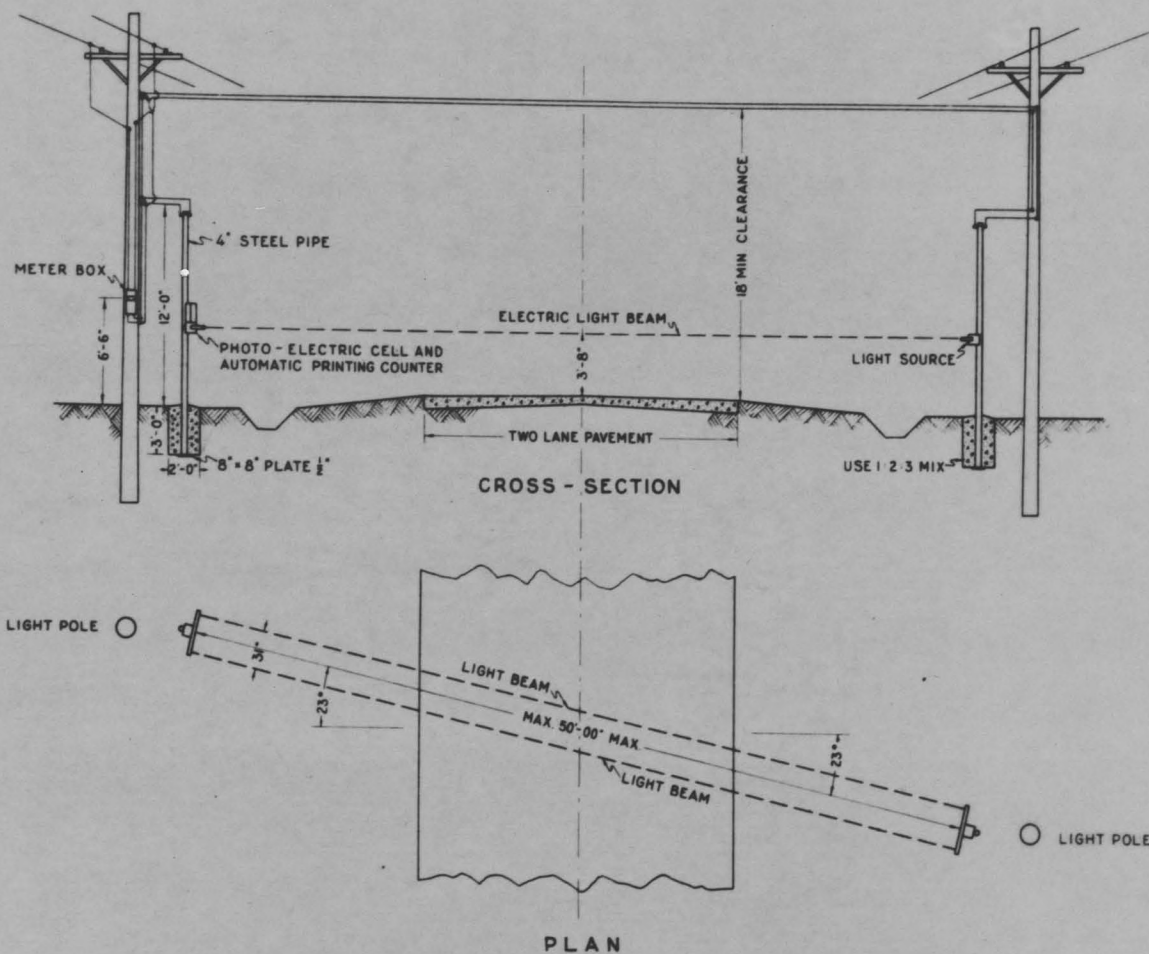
PROPOSED LAYOUT OF AUTOMATIC TRAFFIC-COUNTER INSTALLATION
